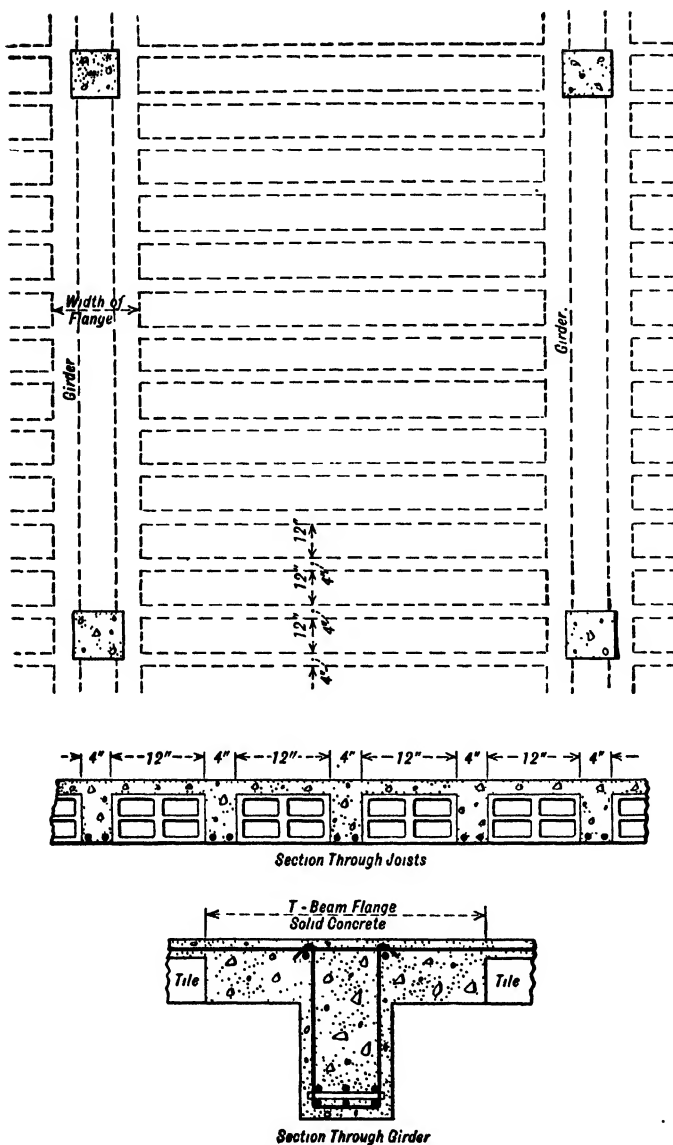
Hollow Tile and Concrete Floors. (See p. 590.)
